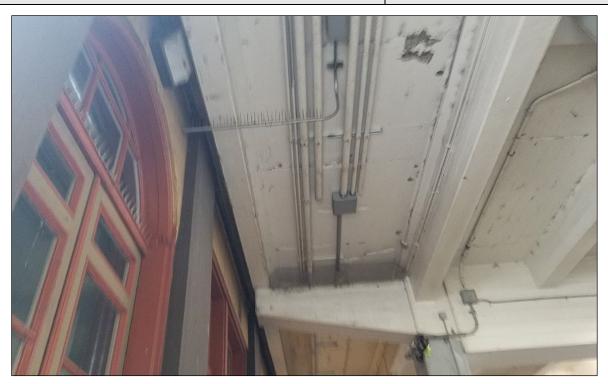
White Stag Block (Skidmore Building), detail of south façade of building under west approach of Burnside Bridge, view looking east (David Ellis, 2021).
